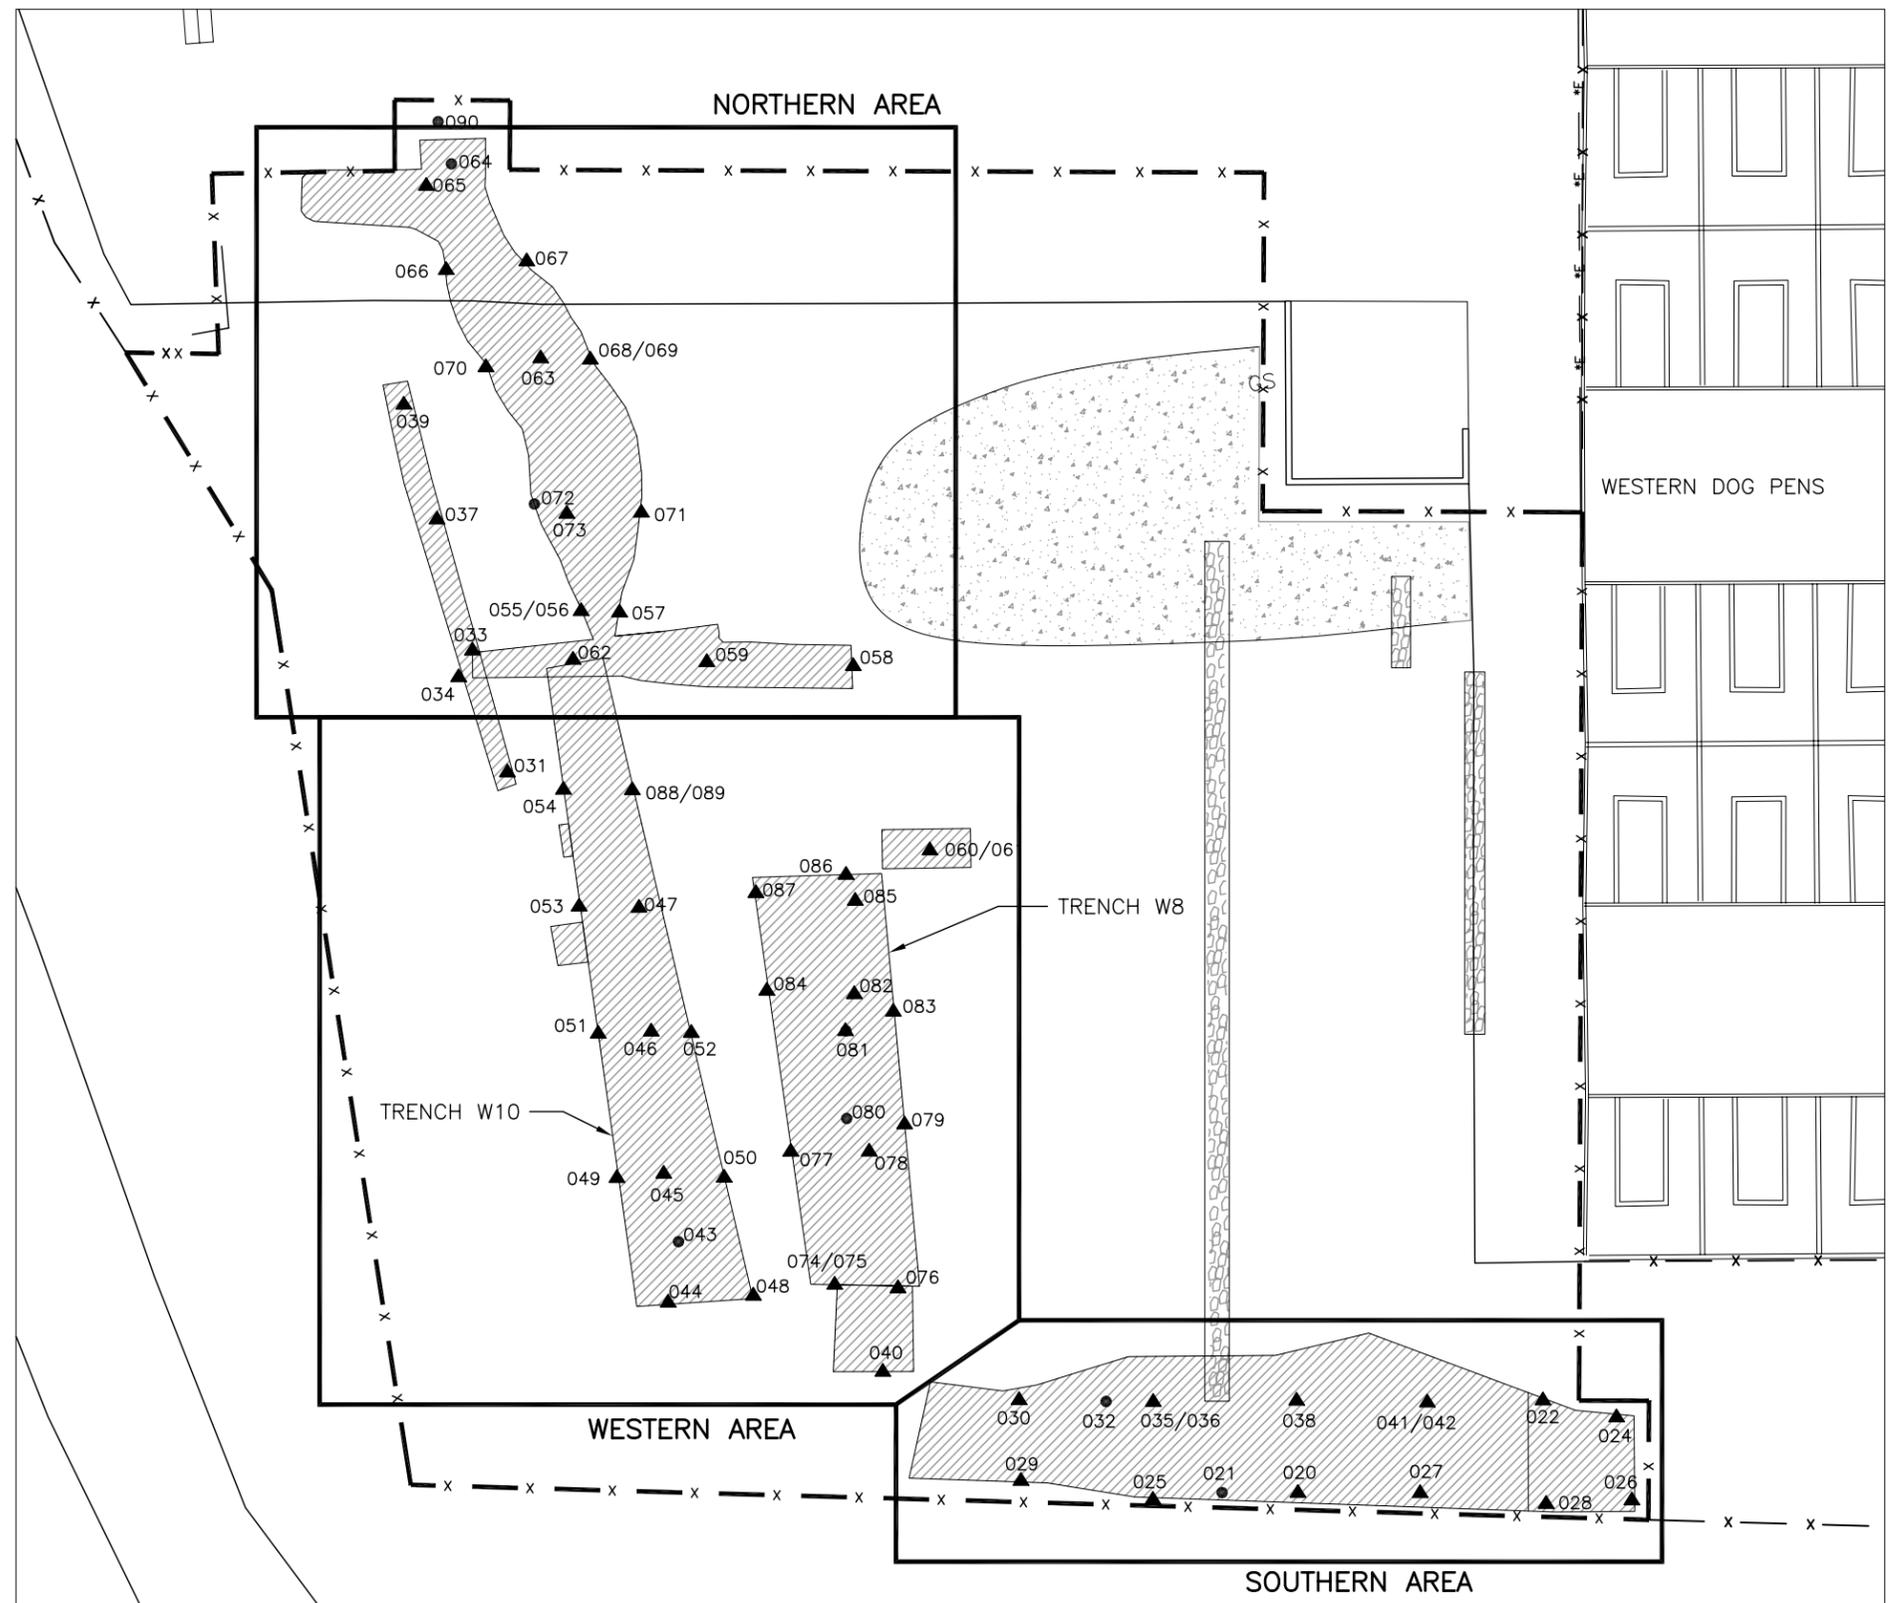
Chlordane Excavation Confirmation Sample Locations for the Southwest Trenches Area
